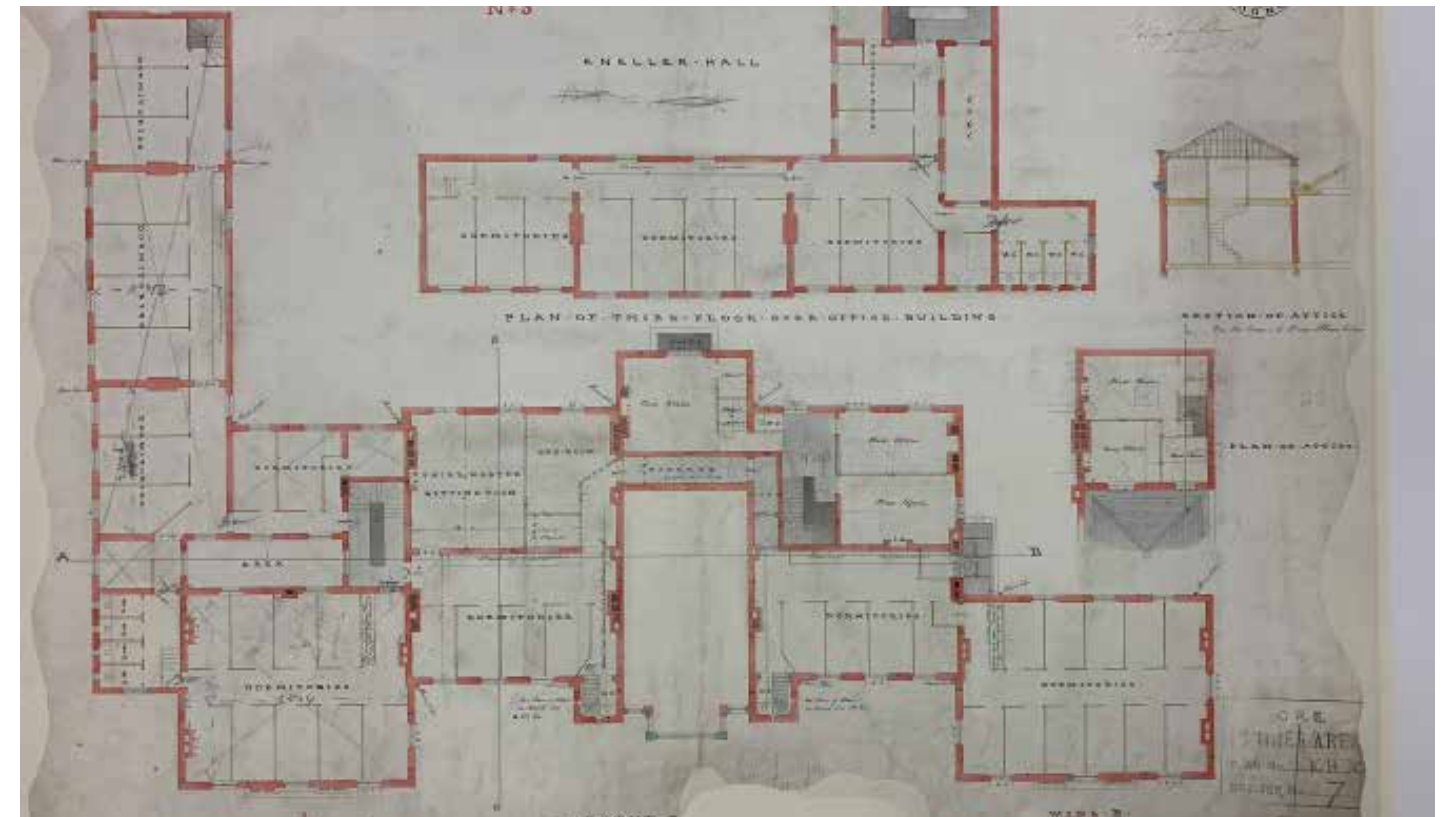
1844 proposed second floor plan of Kneller Hall, partially realised (red showing the proposal). By George Mair.
